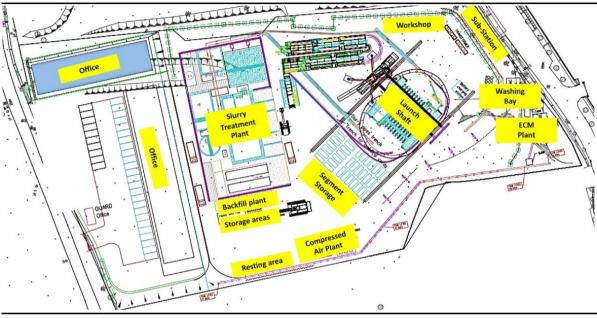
Typical Worksite Layout at Tunnel Boring Machine Launch Shaft
